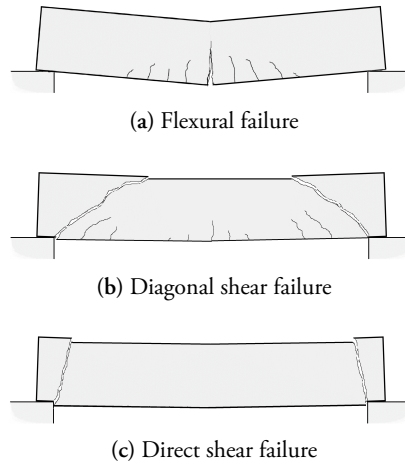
Example of failure modes for reinforced concrete beam subjected to uniform impulse pressure.
